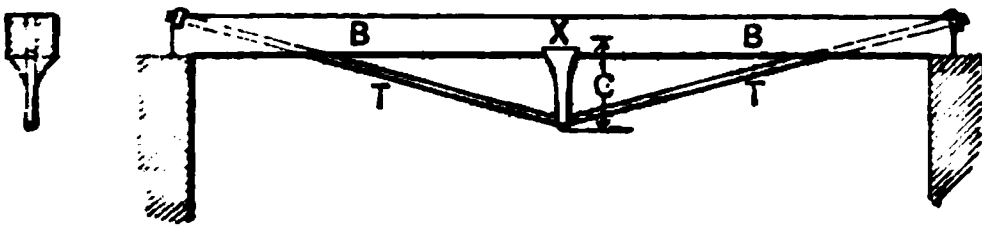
Trussed Wooden Girder. One Vertical Strut
